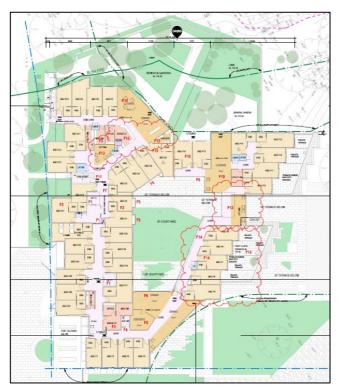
Stamped Plans – First Floor Source: Morrison Design Partnership Pty Ltd
